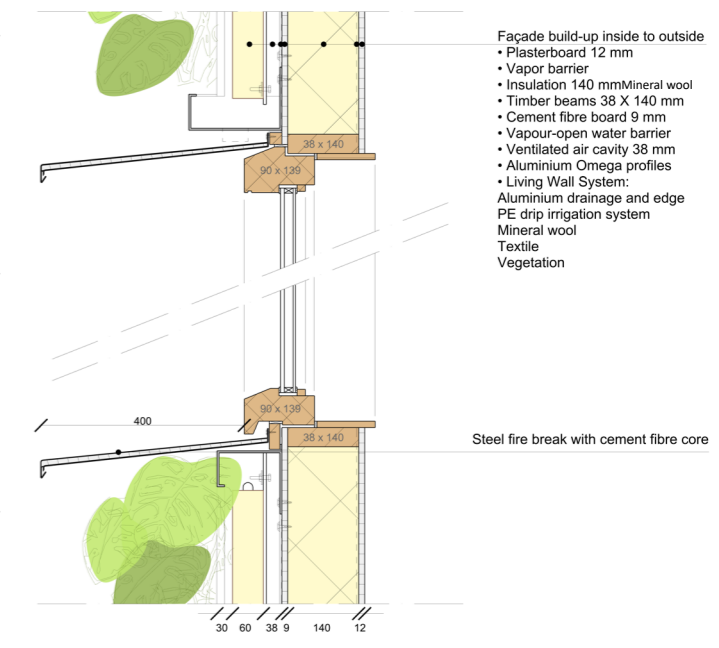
Lower risk façade detail with LWS. Drawn 1:5 scaled to 1:15 (Own work)
